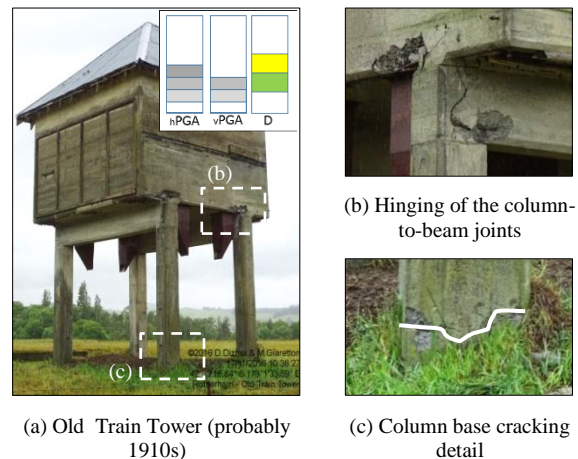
Vintage concrete structures in Rotherham (hPGA 0.280g).
